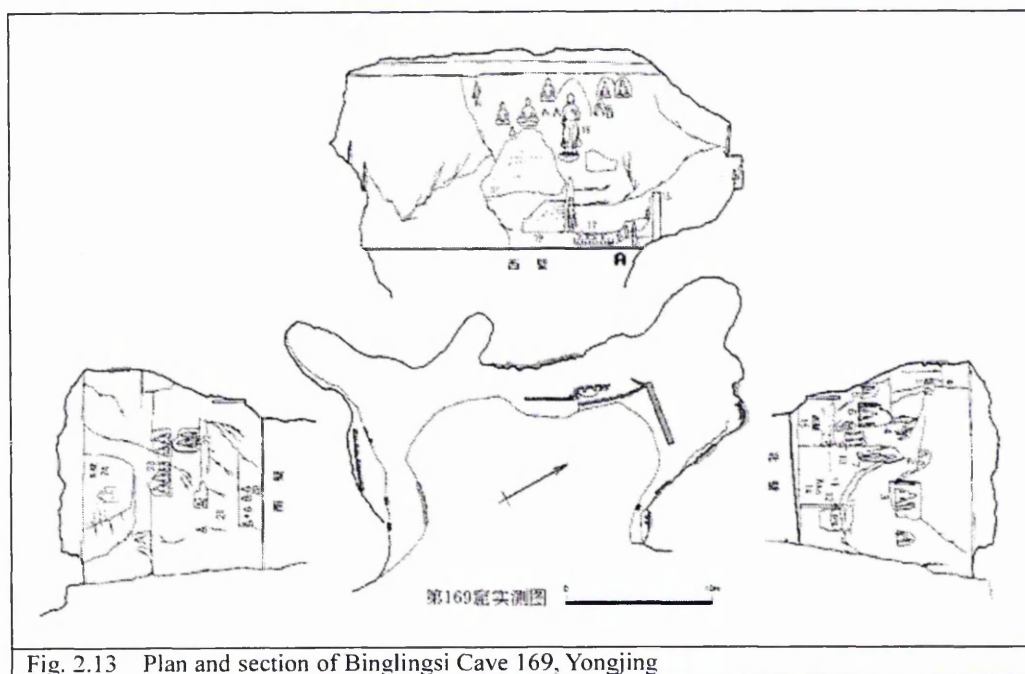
Plan and section of Binglingsi Cave 169, Yongjing
